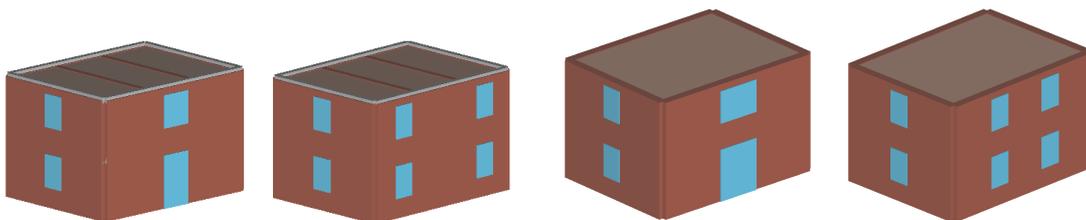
Isometric views of the considered models (2 floors case, with and without internal walls)
